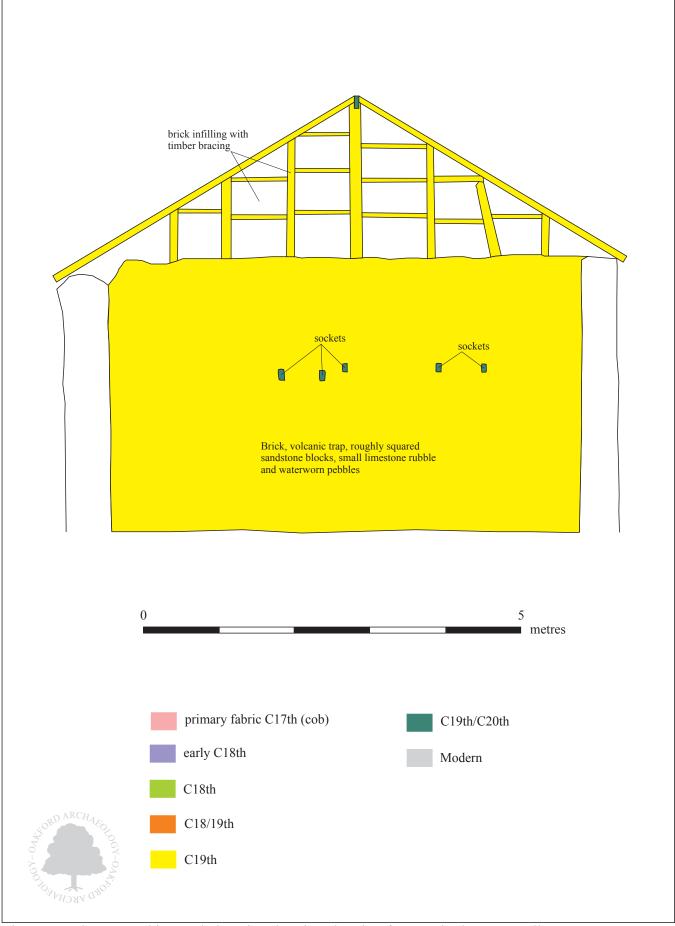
Hand-measured internal elevation drawing showing features in the west wall.
